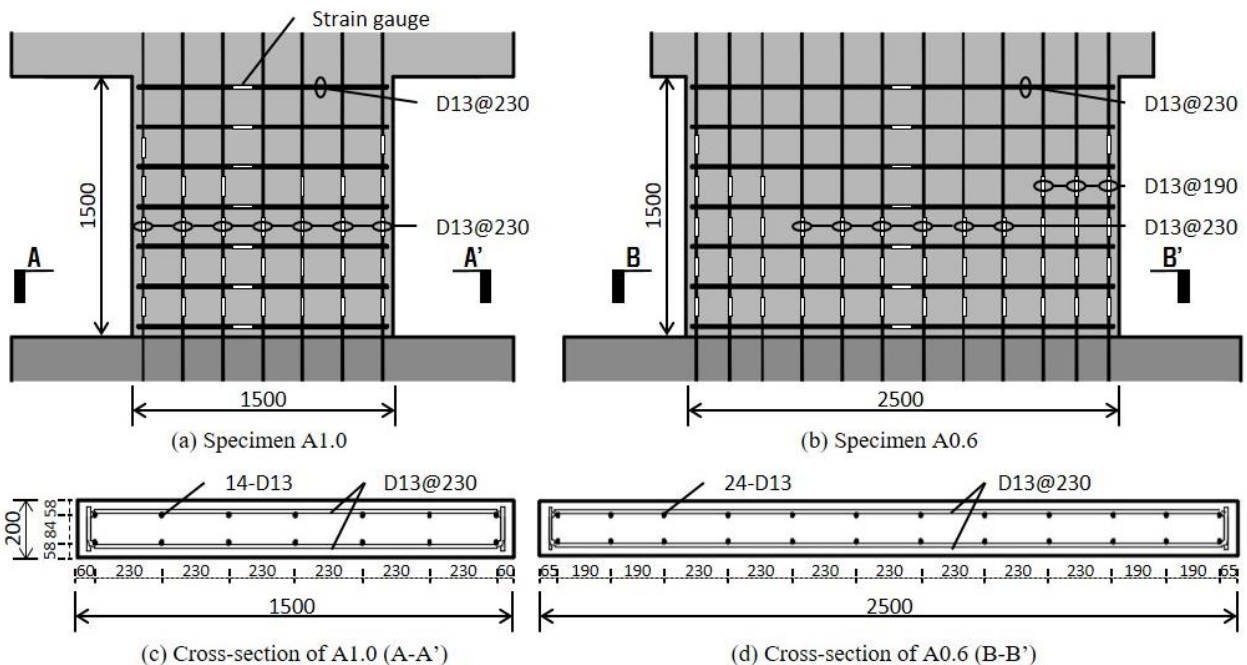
Dimensions and reinforcement details of specimens (Units: mm)
